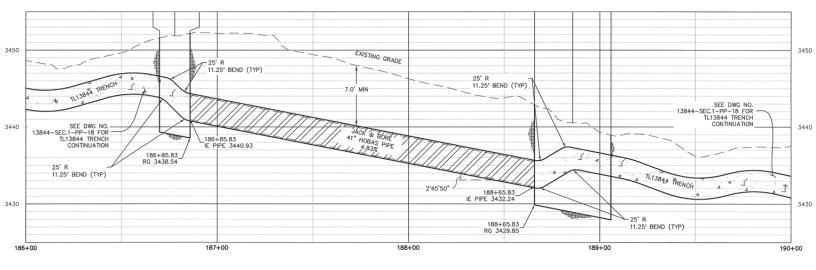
PLAN AND PROFILE DRAWINGS (2 Pages)
